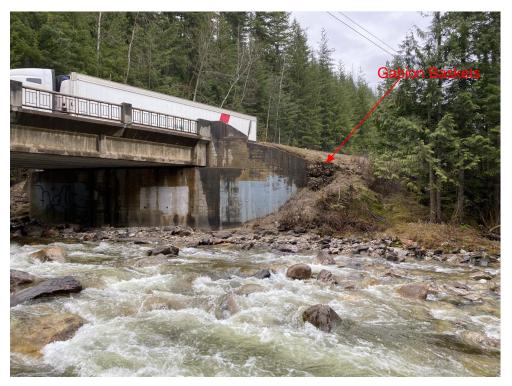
View looking northeast (upstream) at the Crazy Creek Bridge (Photograph by BGC taken on April 26, 2023).
